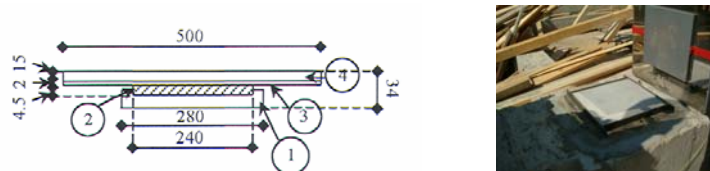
Cross section (1. square stainless steel bottom plate; 2. lubricated square Teflon disk; 3. austenitic steel sheet; 4. square stainless steel top plate – dimensions in millimeters) and view of a M 1400 ST slider
